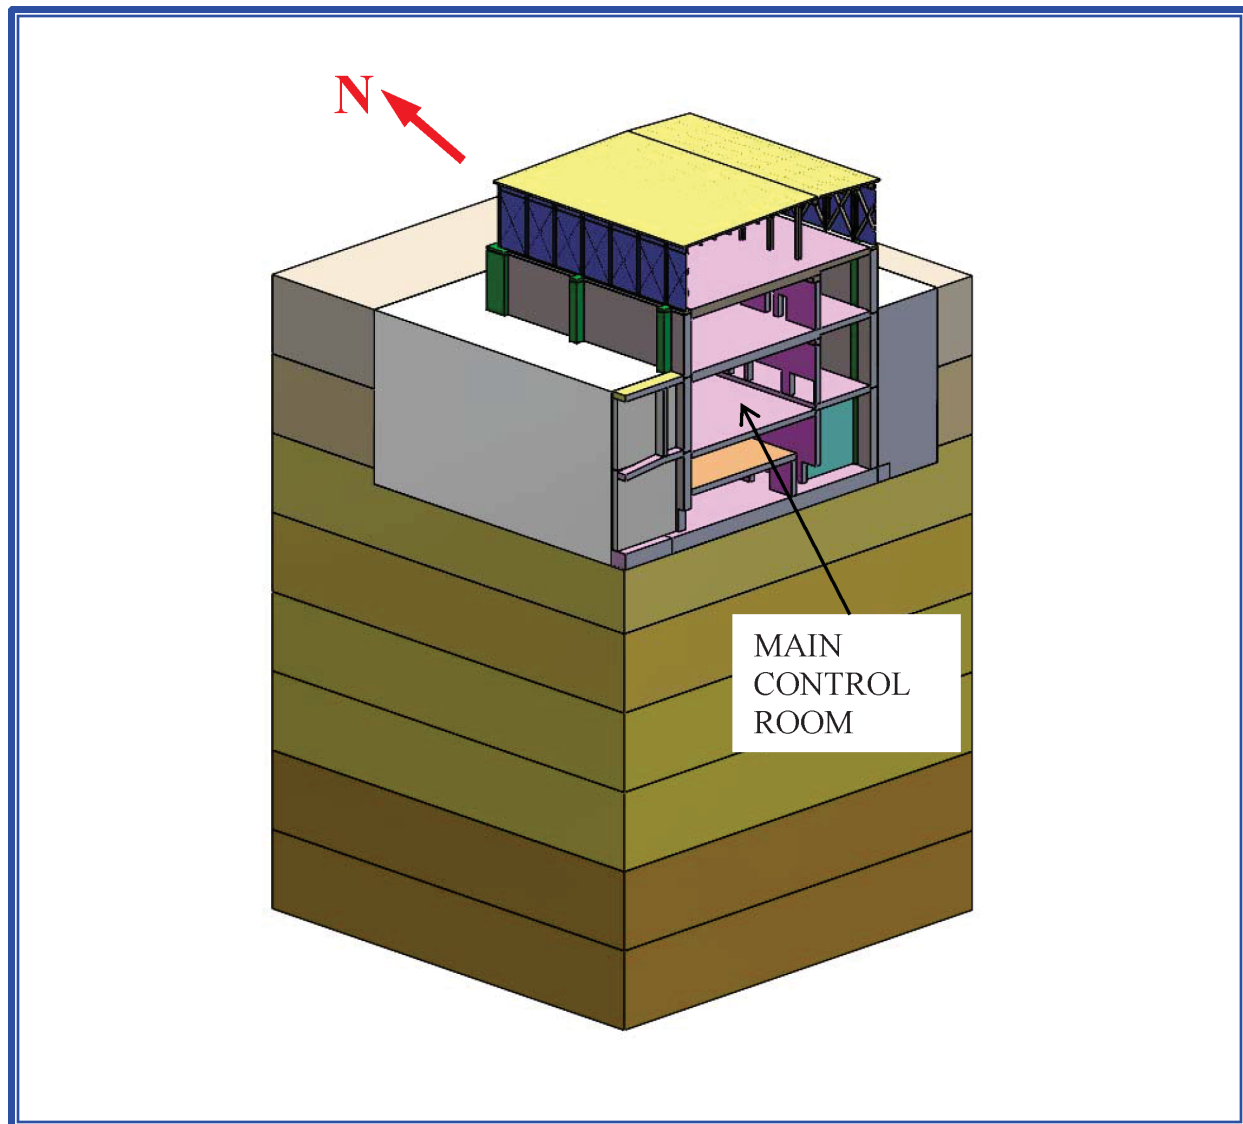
North-South Section Cut View of Control Building in Soil
